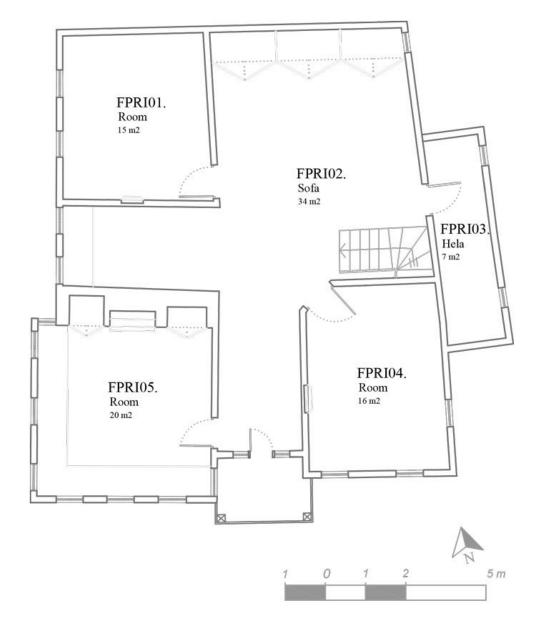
Pre-intervention ground floor layout of Abdi İbrahim house (redrawn by the Author, 2023)
